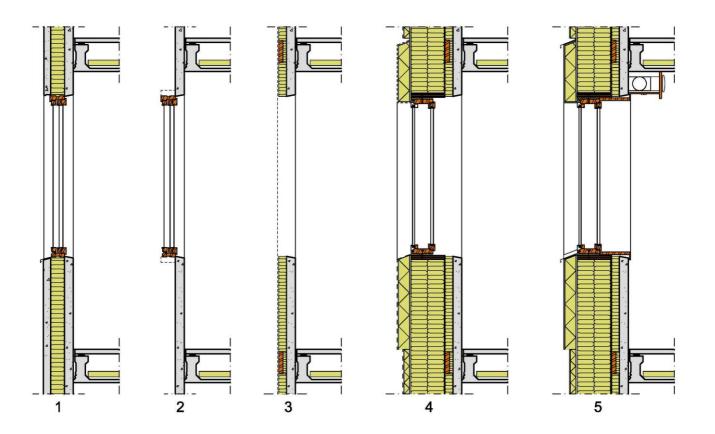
The outermost concrete layer of the sandwich element is dismantled (2) and the existing thermal insulation removed. 70 mm of thermal insulation is mounted on the concrete surface (3) to make the surface even enough for the elements. The facade element (4) has 350 / 400 mm of thermal insulation. The windows, the balcony doors and the vertical ductwork for the supply air are installed in the elements. The finishing work is done on site (5). Image: Kimmo Lylykangas Architects.
